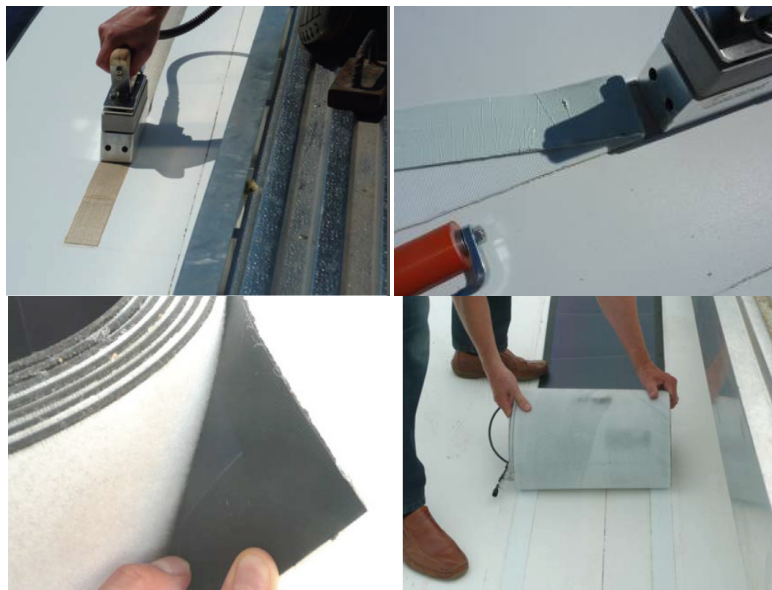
Upper left: Welding the PTFE / glass membrane strip to the membrane structure using "iron".
